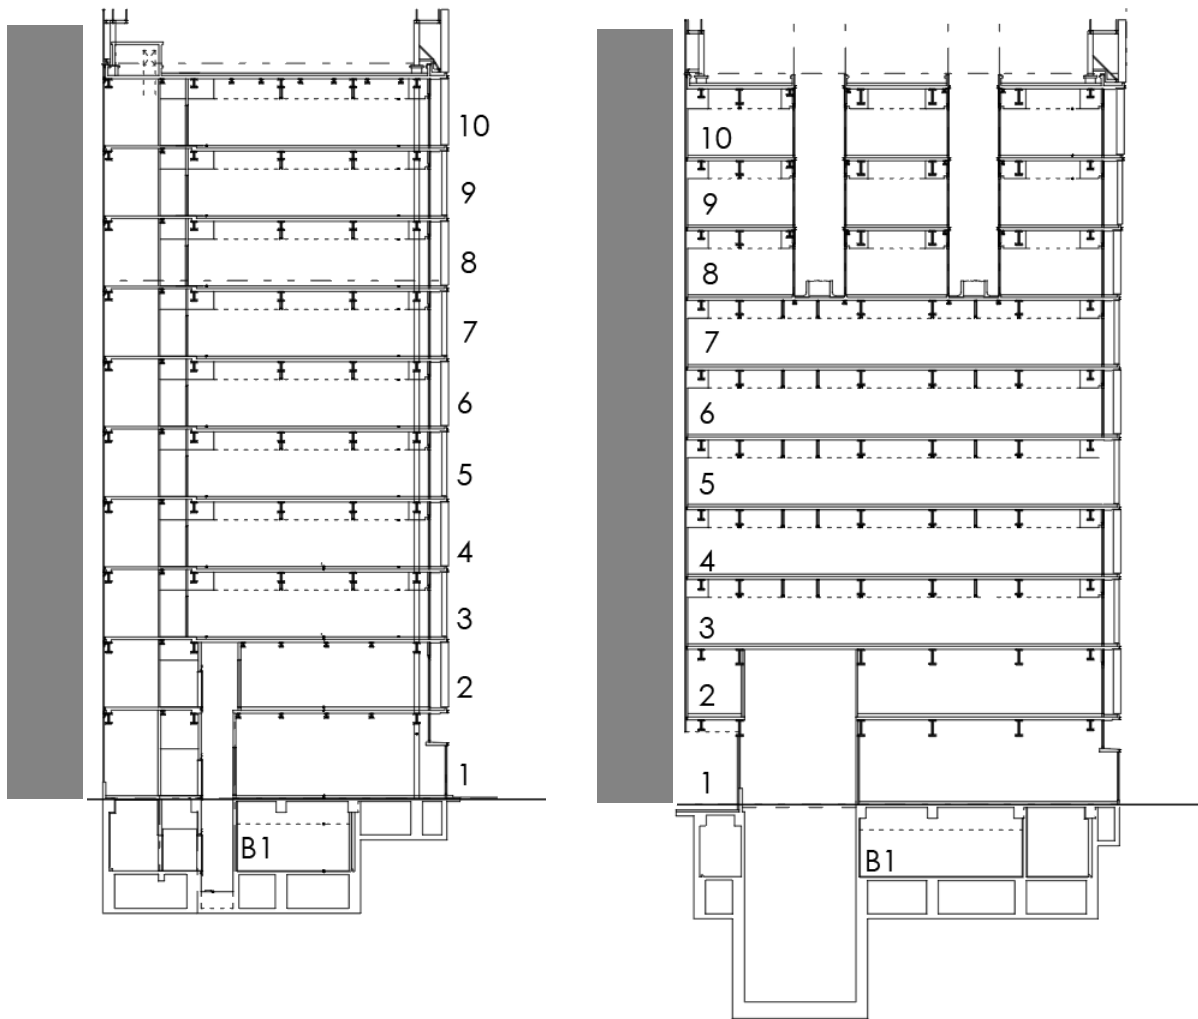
Building sections: northwest-southeast (left) and southwest-northeast (right)
